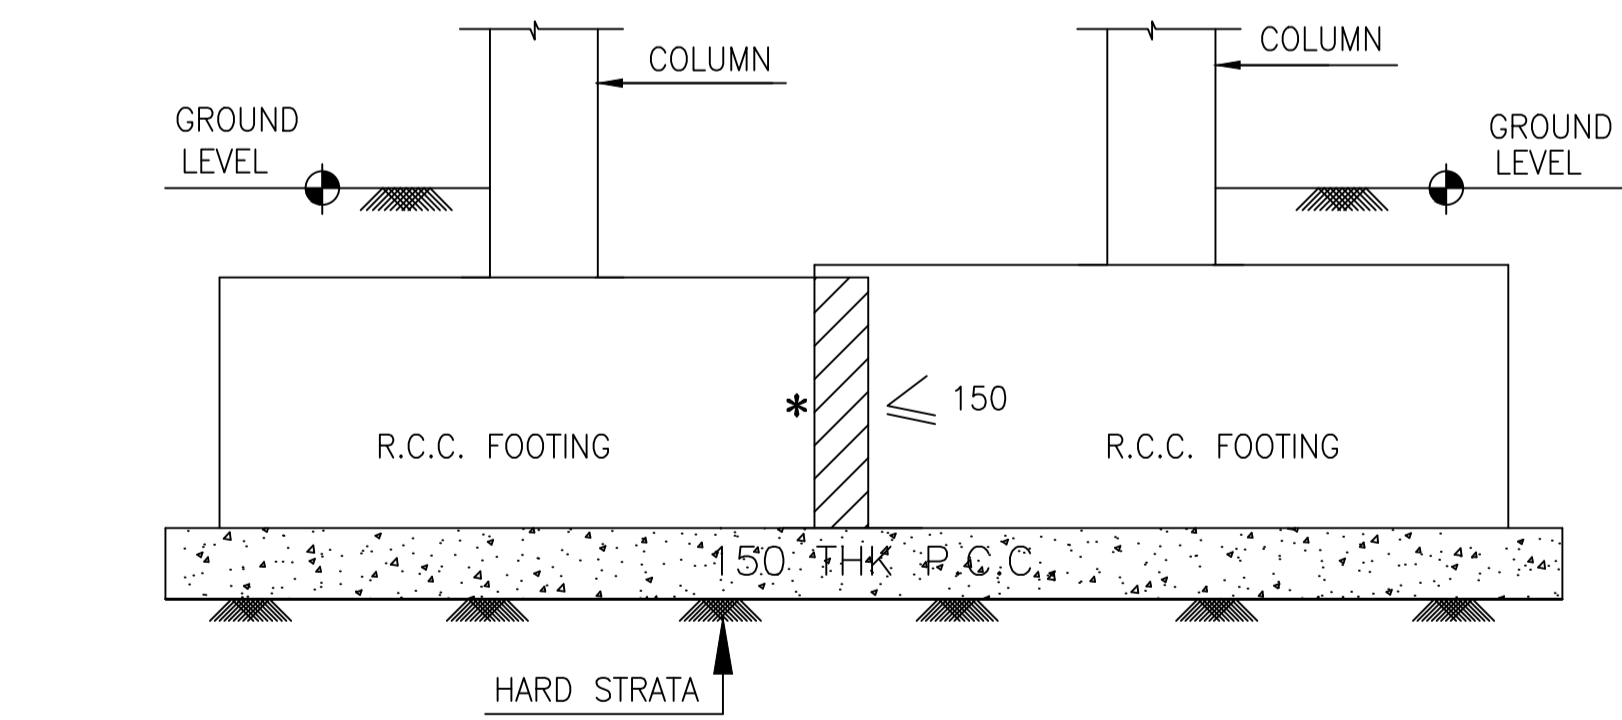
DETAIL TO BE FOLLOWED WHEN TWO ADJACENT FOOTINGS ARE AT DIFFERENT LEVELS
